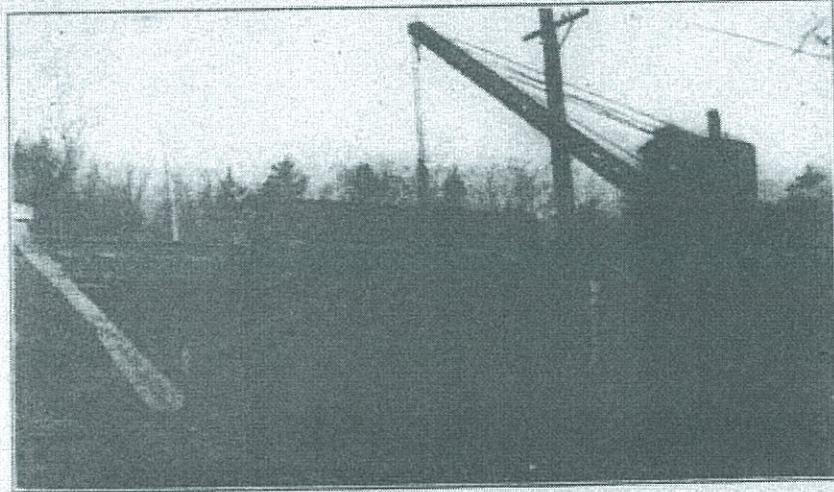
G.T.R. Grade Separation. Locating a Subway Girder.
